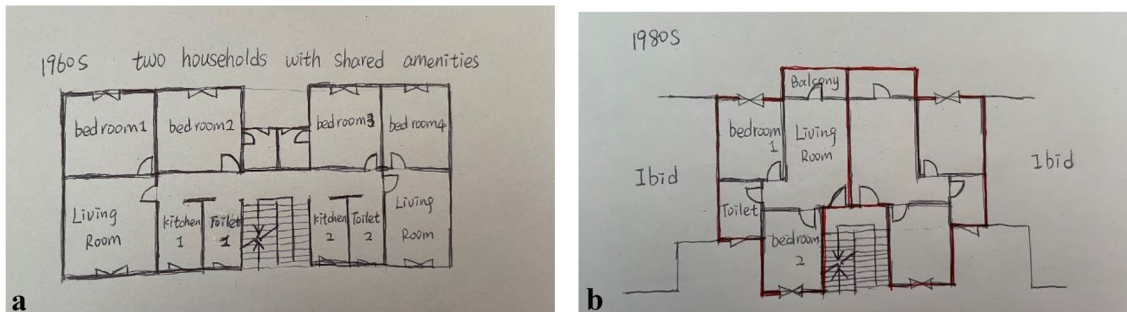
Floor plan of the 1960s (a) and 1980s (b). Ling, Yuying. Sketch of the floor plan of the 1960s' apartments. June 10, 2023. Ling, Yuying. Sketch of the floor plan of the 1980s' apartments. June 10, 2023
